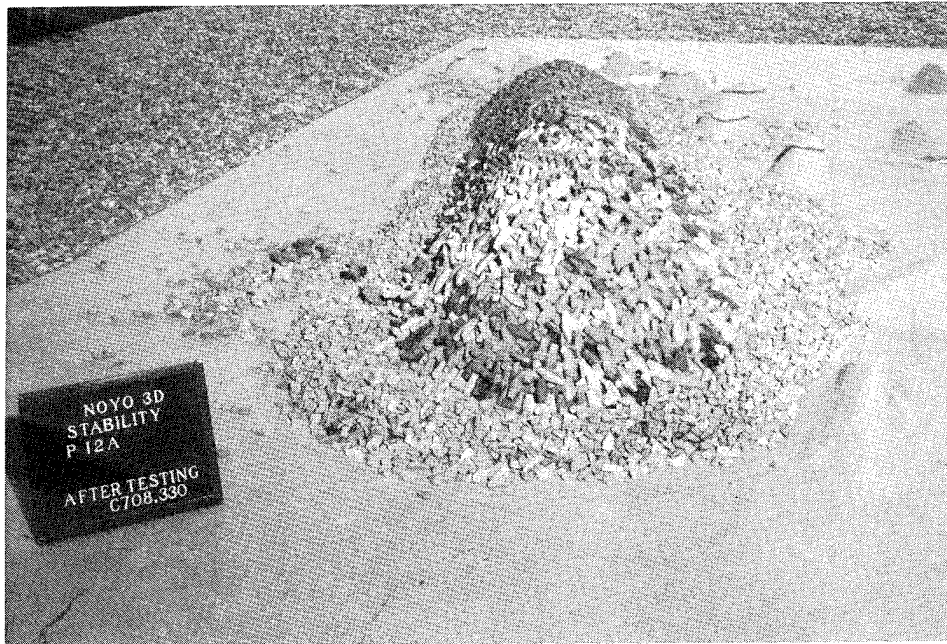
Plan 12, north roundhead after two series of Storm IA waves
